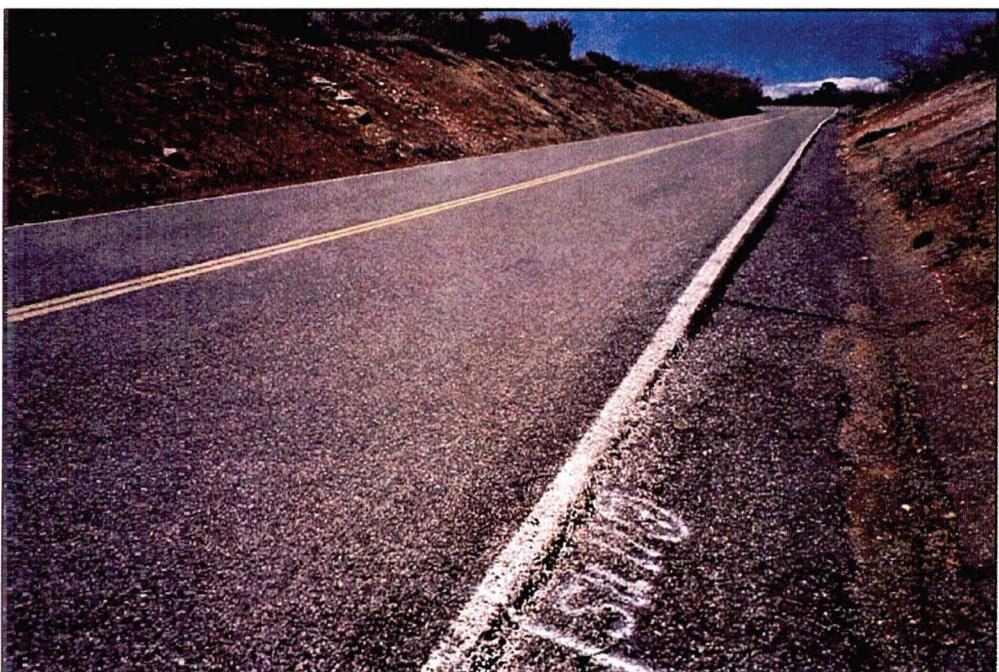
Section 7, Sample Unit 11 (MP 5.75)
